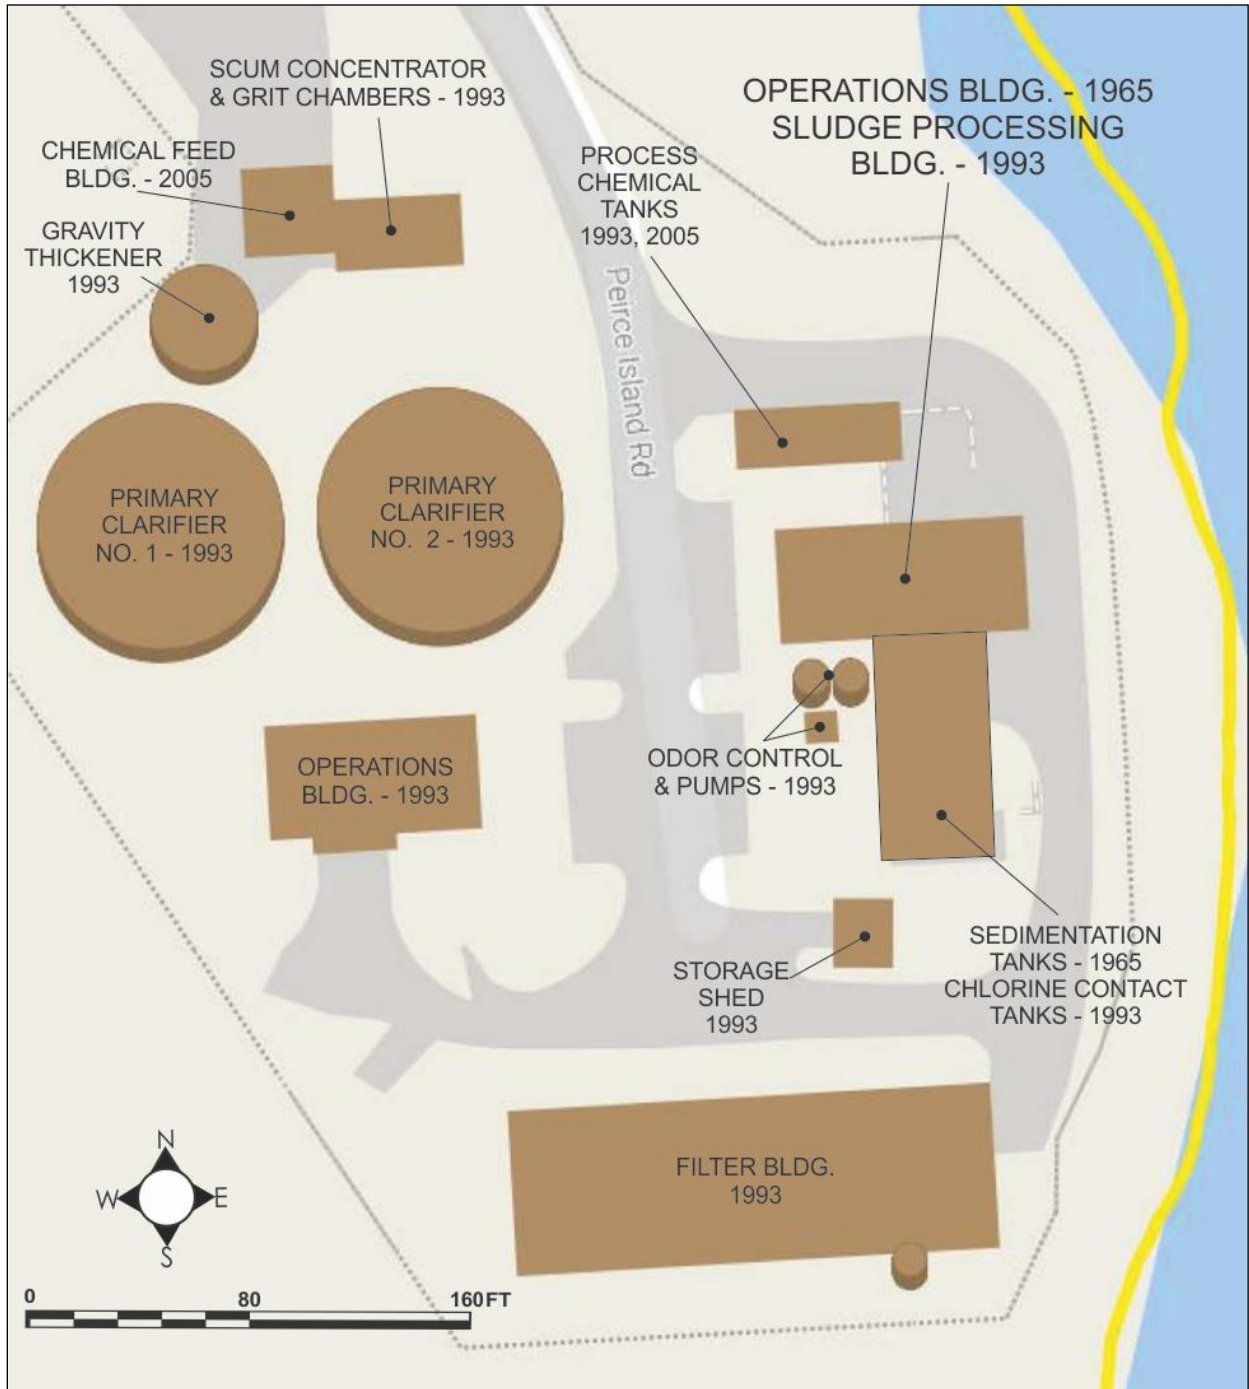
Portsmouth Wastewater Treatment Facility in 2016, identifying buildings and structures with dates of construction and reconstruction where applicable (Portsmouth NH GIS Tax map).
